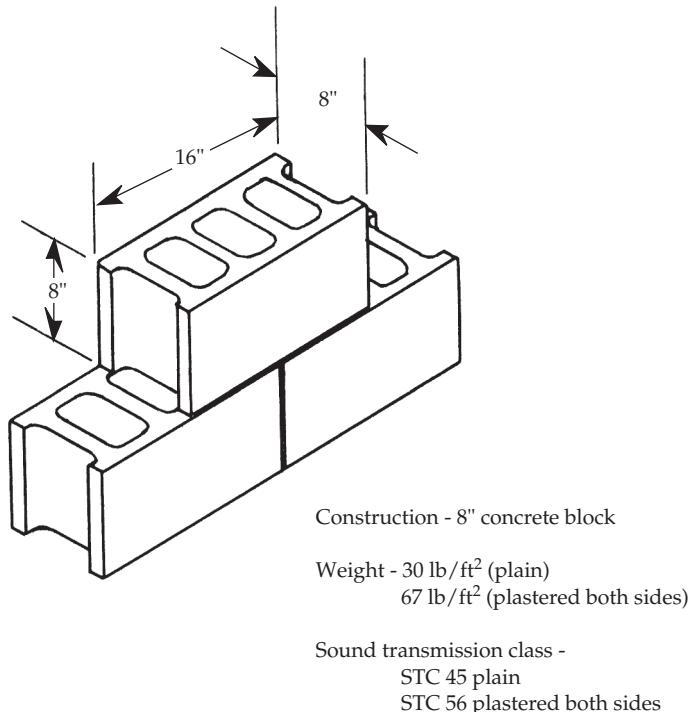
Concrete-block (8-in) wall construction. (*Solite Corporation, and LECA.*)
